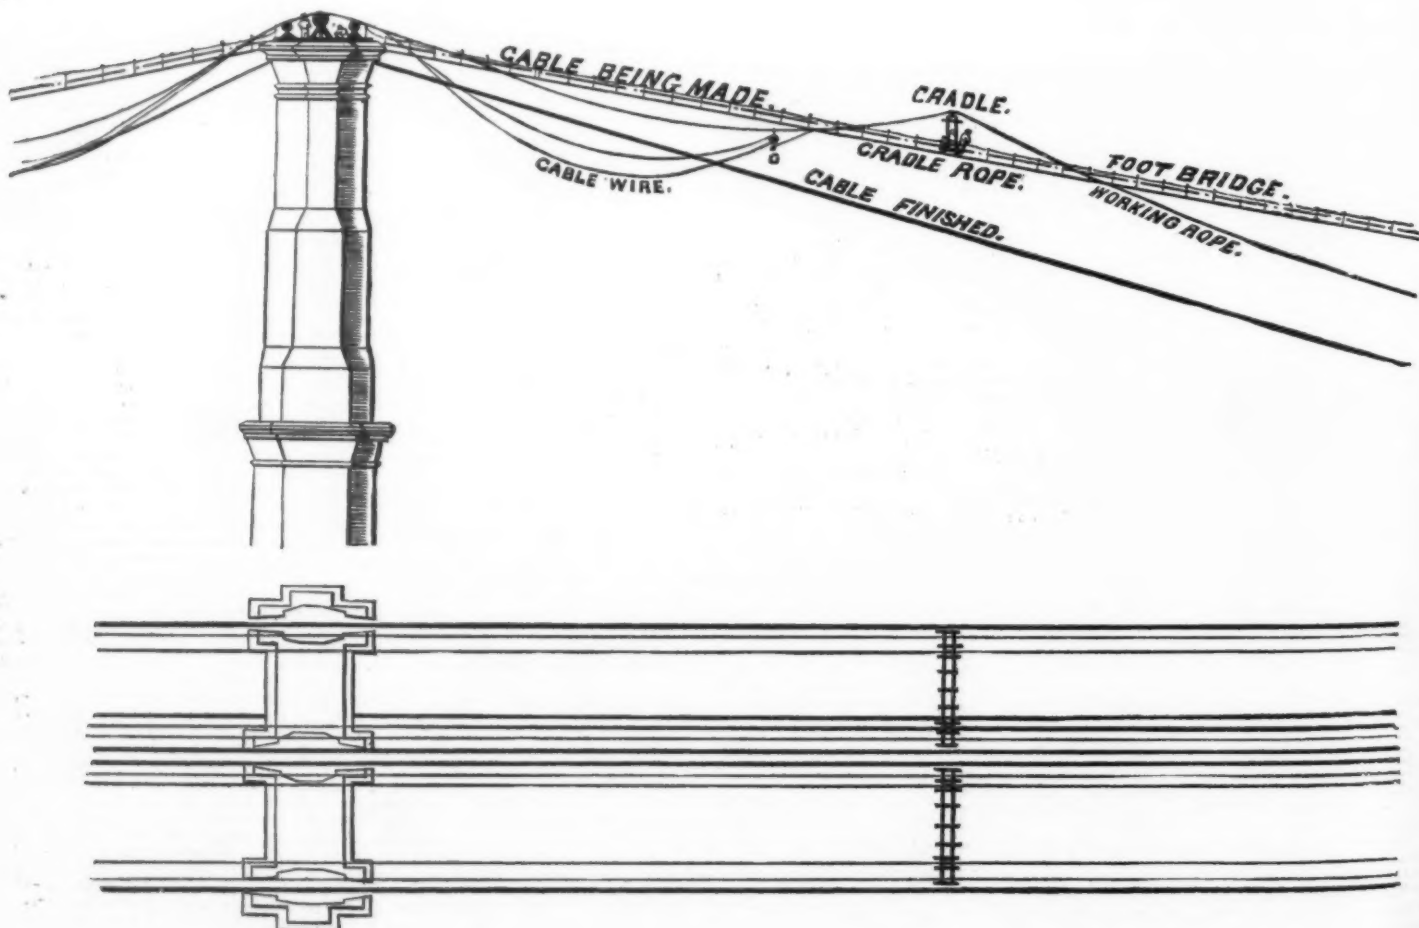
PLAN AND ELEVATION SHOWING CABLE, CRADLE, AND FOOT BRIDGE.
